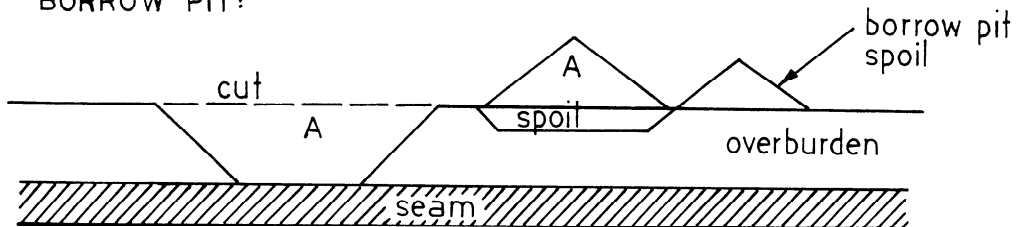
Area/dragline stripping (Anon., 1975; by permission from Skelly and Loy, Harrisburg).
